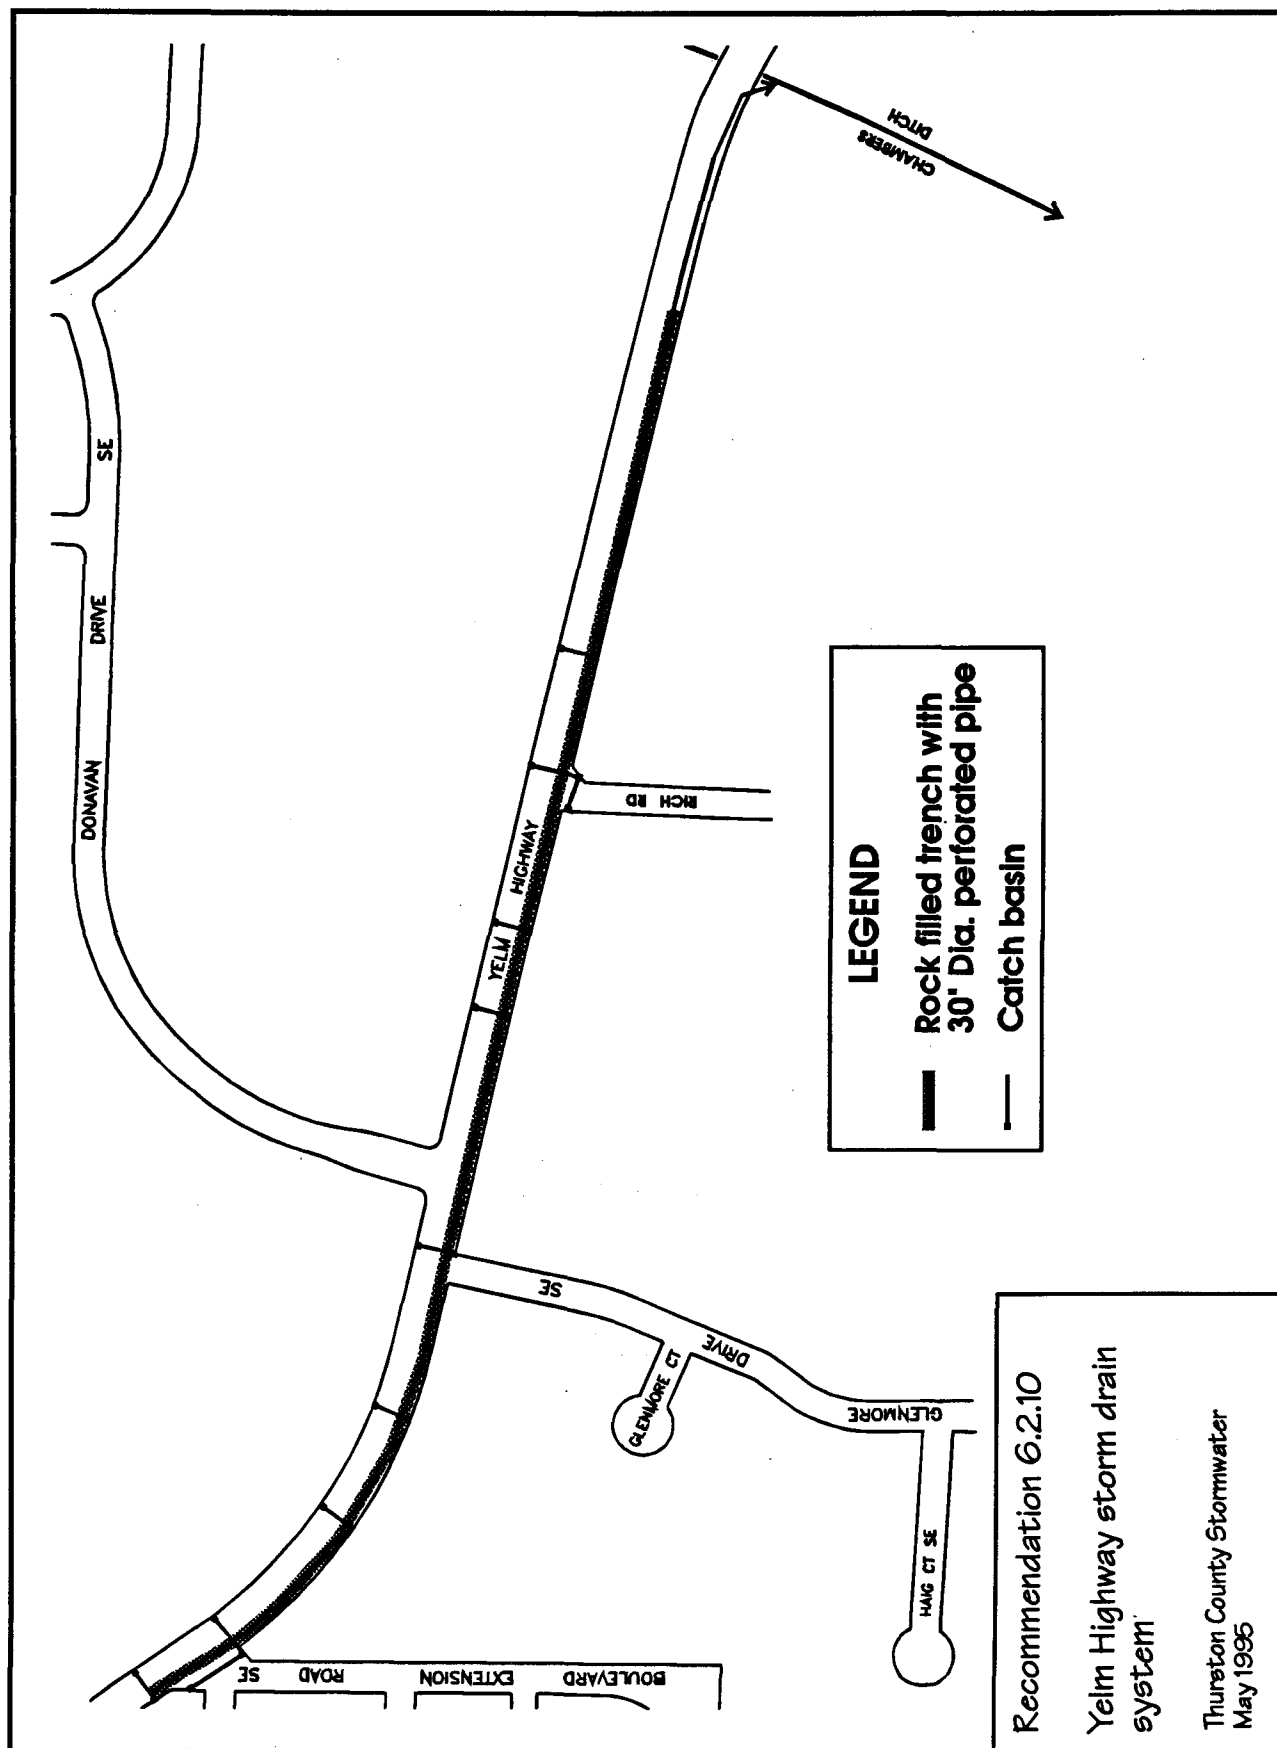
Yelm Highway stormwater system west of Chambers Ditch
